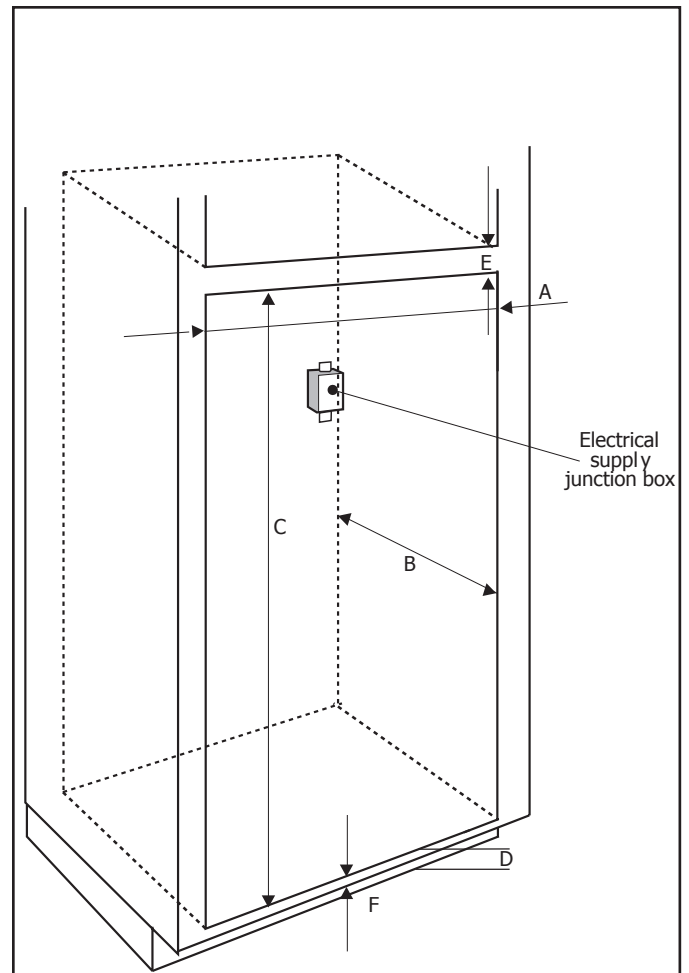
Double Oven Wall or Cabinet Cut-Out Dimensions
